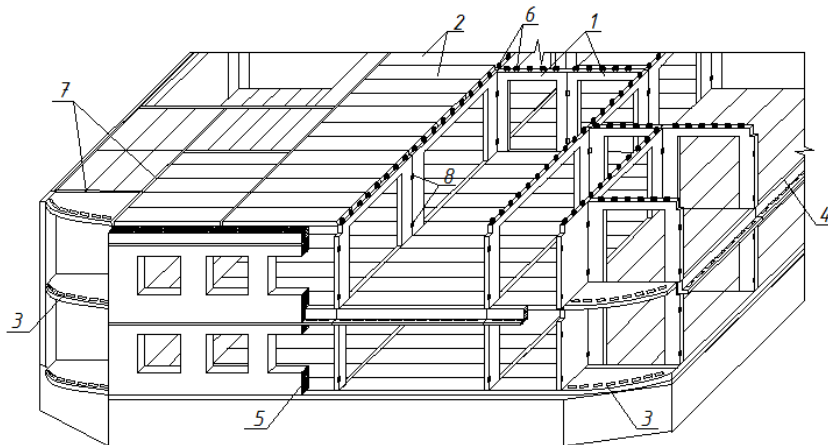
The building of prefabricated elements: 1 - longitudinal and transverse panel-frame; 2 - slabs; 3 - slabs with a perforated edge; 4 - girders with thermo-connectors; 5 - outer self-supporting one floor wall; 6 - starter bars; 7 - in-fill concrete; 8 - panels strutting
